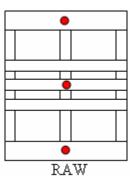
Schematic showing bottom view of string pot locations for RAW bending tests.
